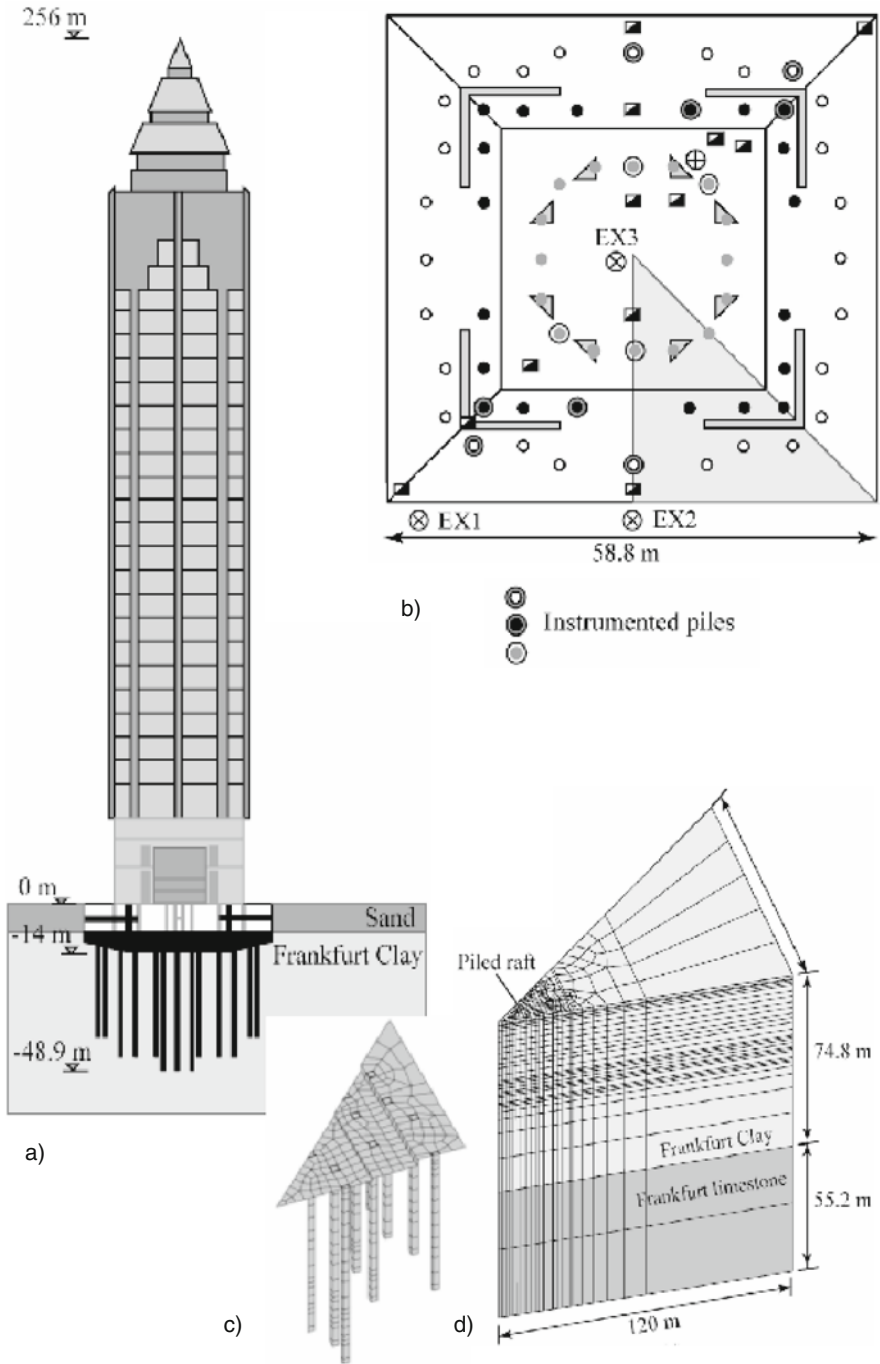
Building with piles in clay (Garcia et al. 2006): overview (a), receivers (b), meshes of structure (c) and ground (d)
